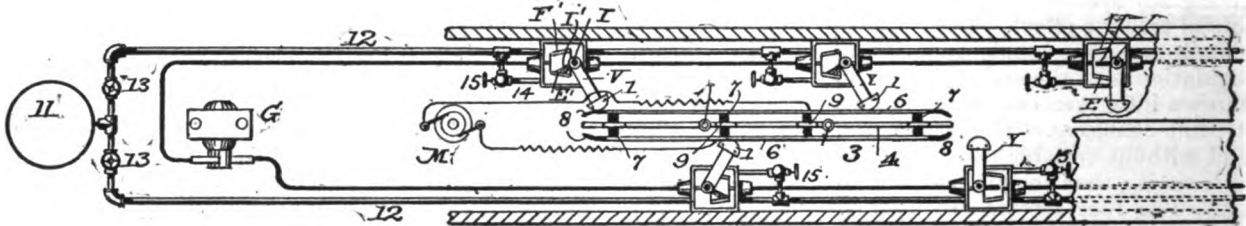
THE UNIVERSAL RAILWAY CONDUIT SYSTEM.
